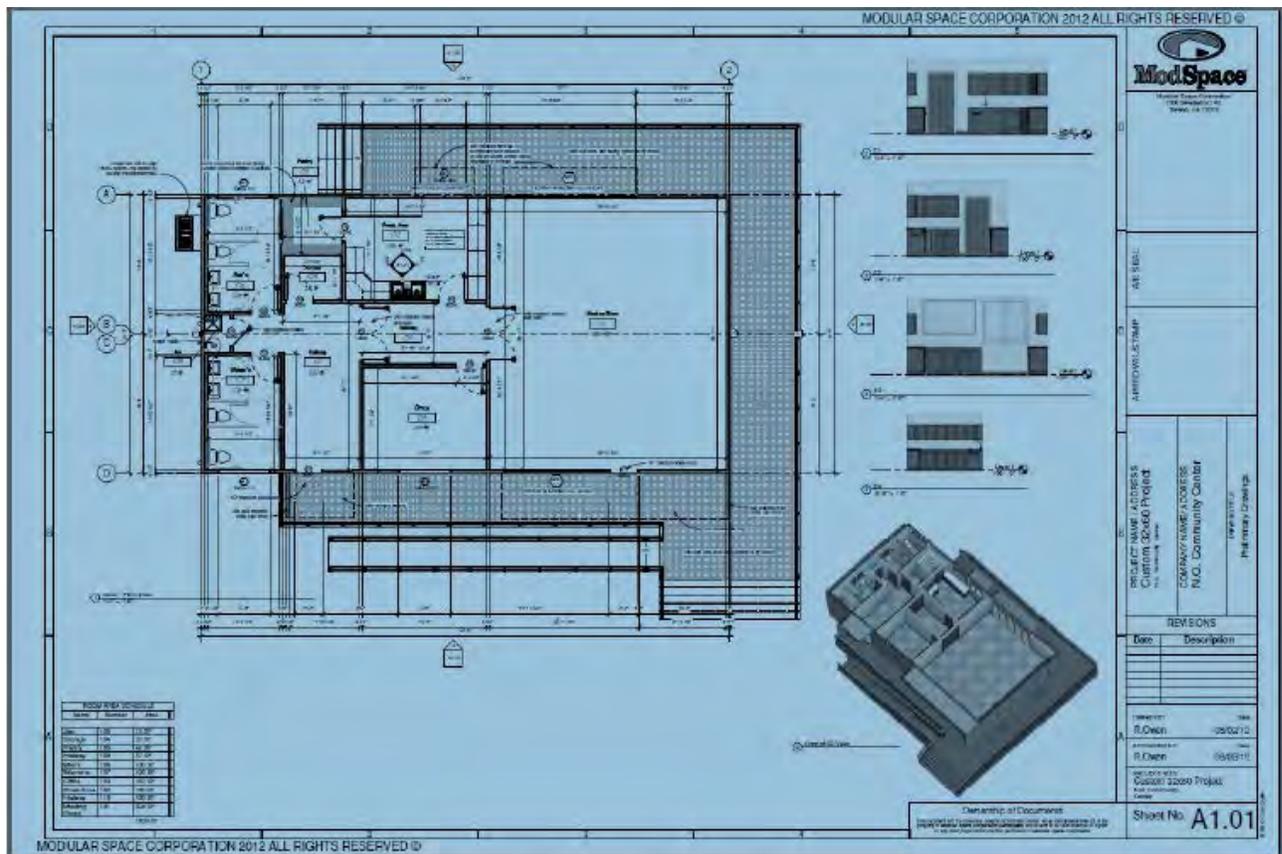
Proposed New Concessions Center, Preliminary Floor Plan
